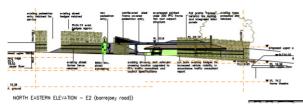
Proposed street view of the built form from Barrenjoey Road.
